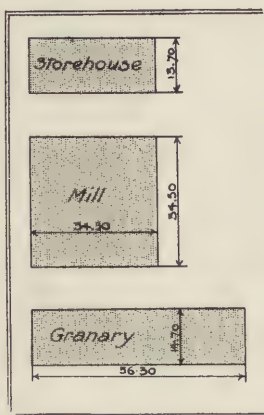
Granary Buildings, Tunis, Block Plan.
